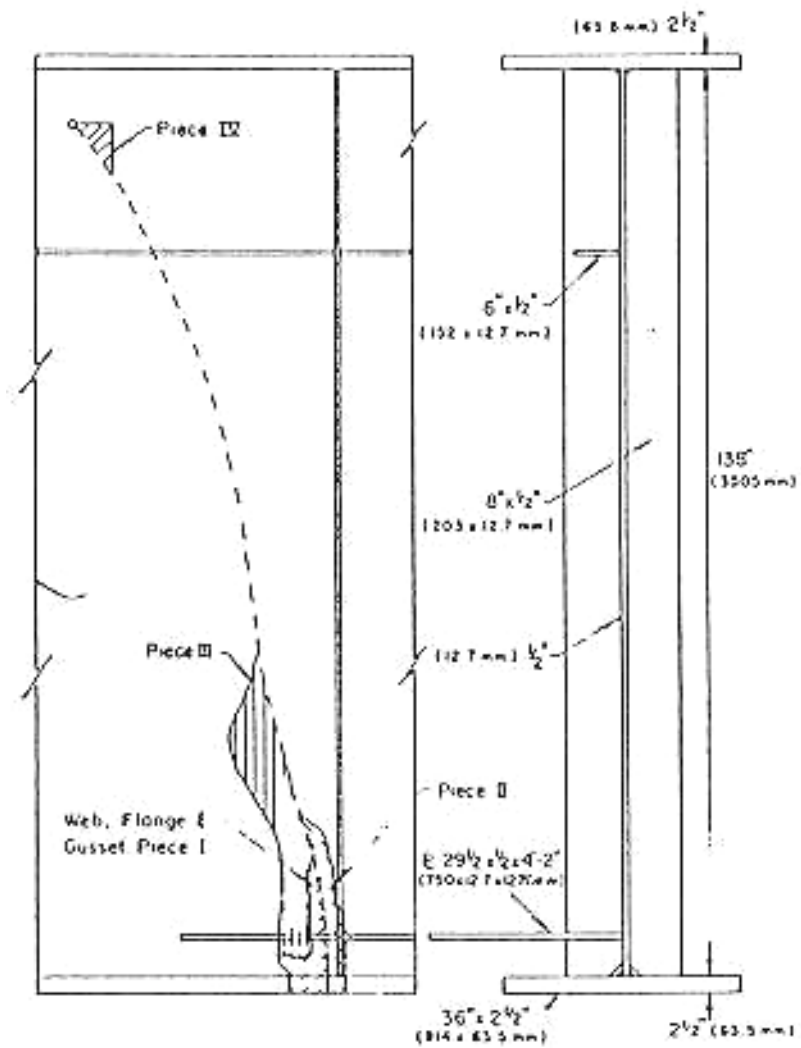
Cross sectional view of Lafayette Street Bridge girder and view of crack after brittle fracture (Fisher et al, 1977)
